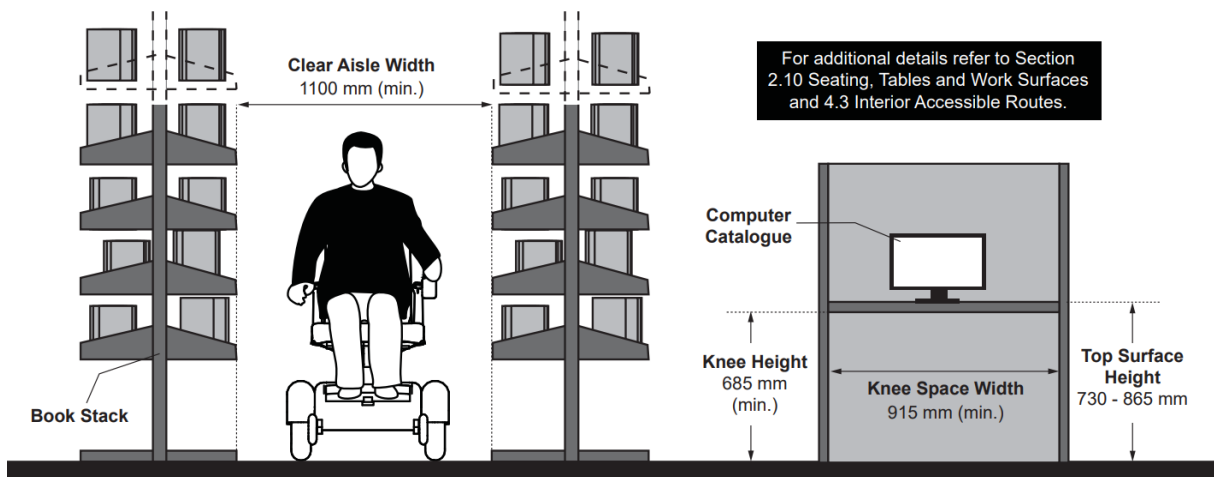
Book Stacks and Accessible Workstation - Elevation View
